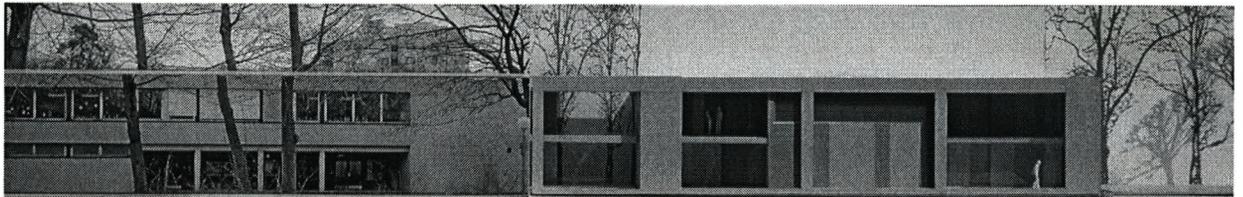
Darmstadt. Photograph of working model of the concrete scheme, showing the layering of concrete, (orange) panels and (green) mural.
